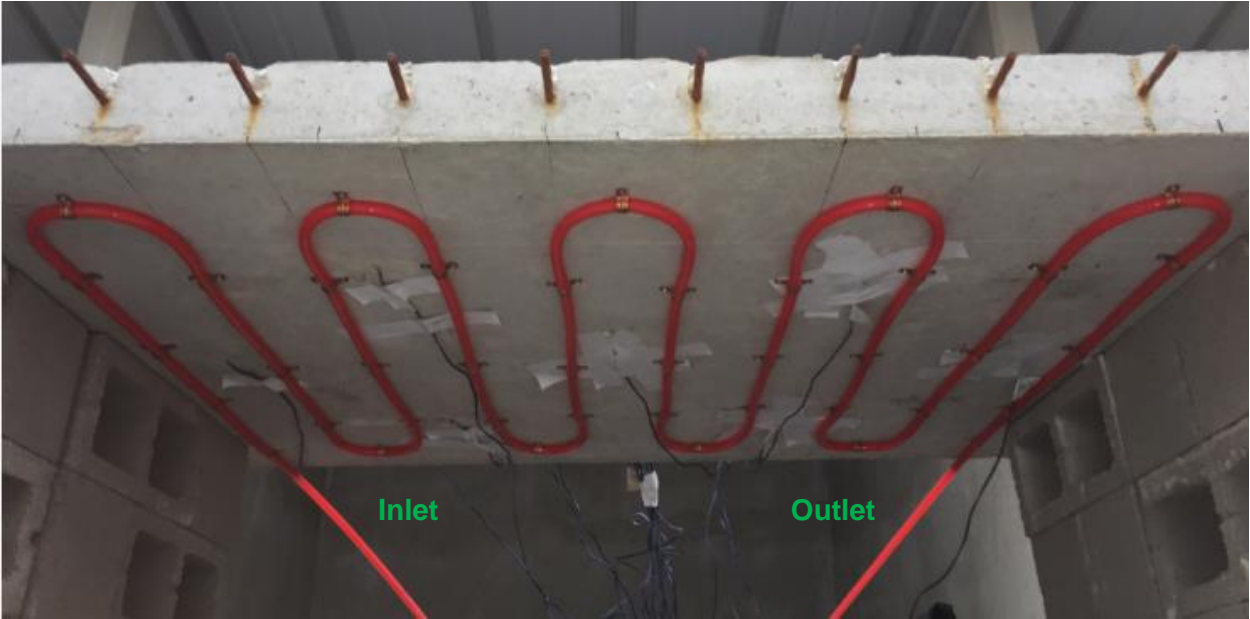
Slab Setup and PEX Pipe Arrangement
